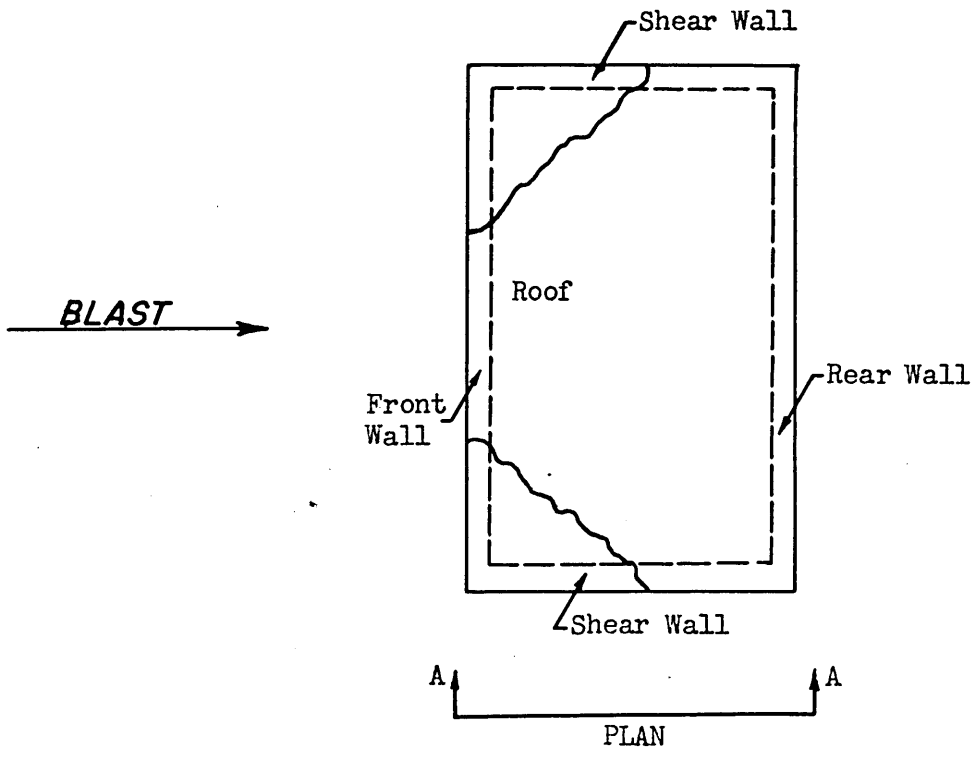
Shear Wall Crack Caused by Redistribution of Horizontal Load in Cracked Roof
